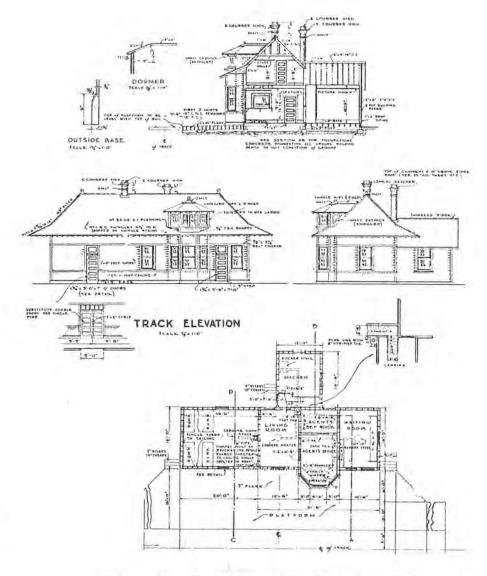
Grand Trunk Pacific Type E station plan  $100-152.^{14}$
